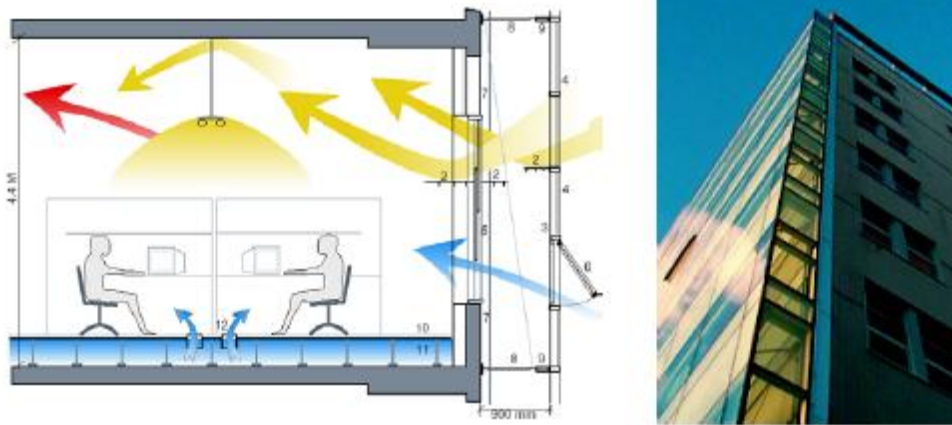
William Farrell Building: (a) section showing DSF (b) northeast corner of building
